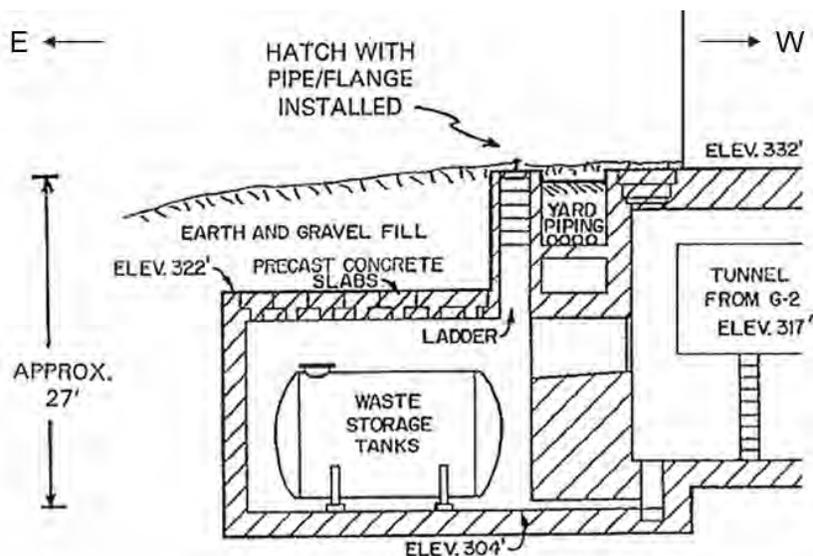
Vertical Section of a Tank Farm Vault Looking South
